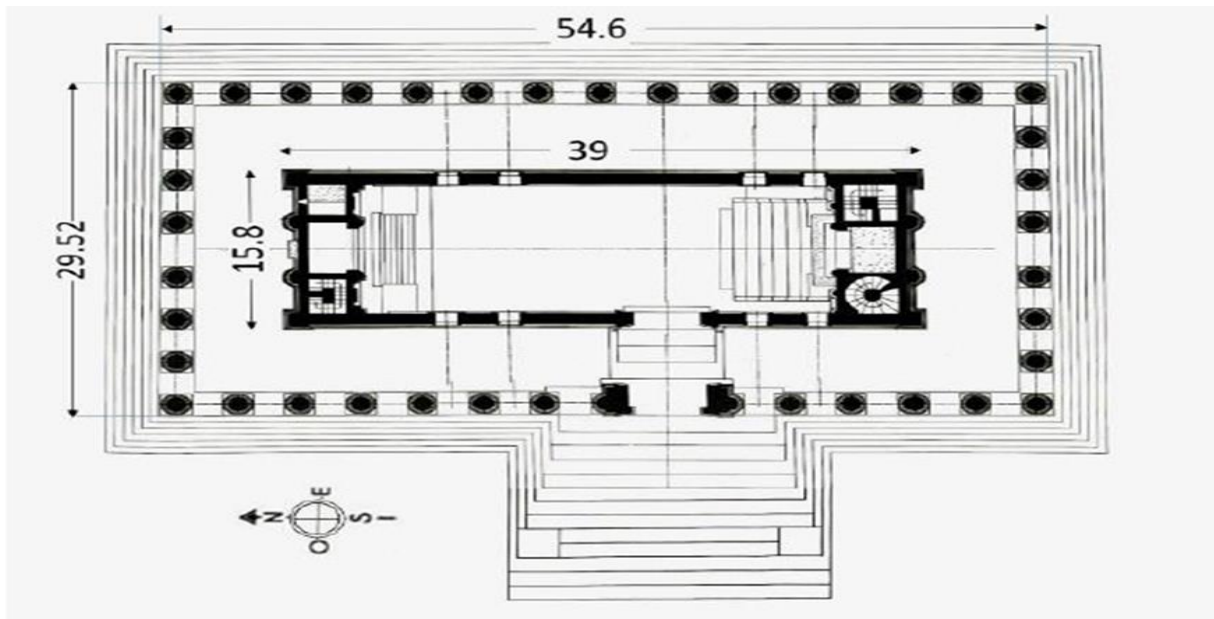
Plan of the Temple of Bel, (dimensions in m)
